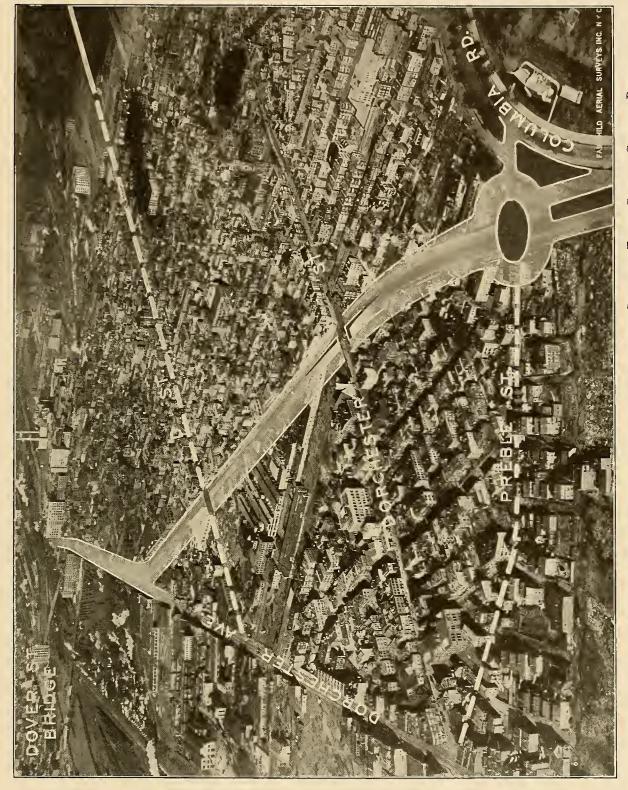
,-OLD COLONY AVENUE WIDENING SHOWING UNDERPASS AT DORCHESTER STREET AND TRAFFIC CIRCLE AT COLUMBIA ROAD.
